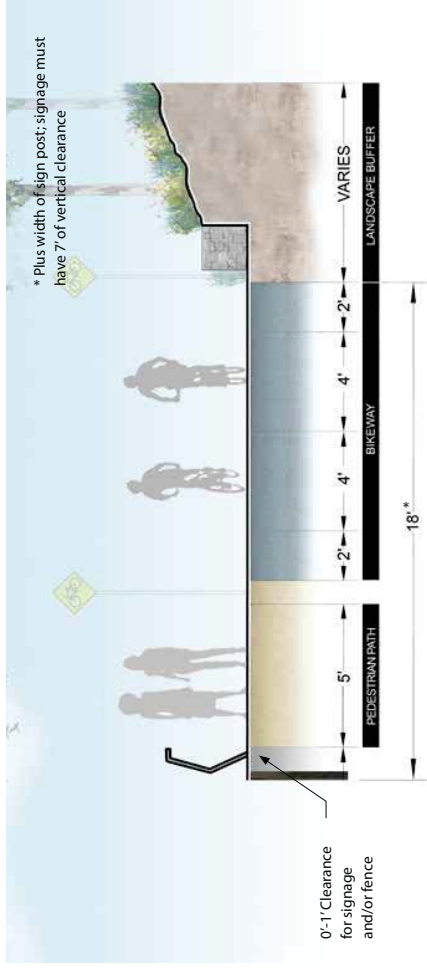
Whitsett Avenue to Laurel Canyon Boulevard-Typical Cross Section
